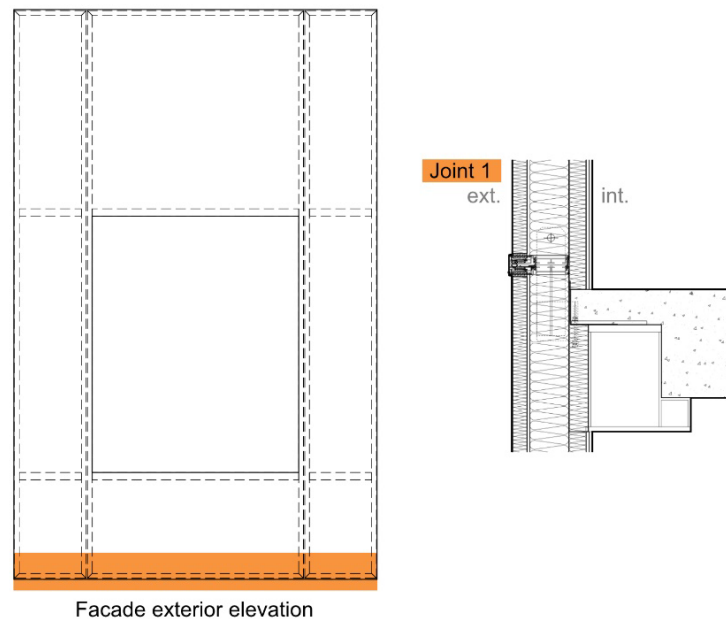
The aluminium frame panel's joint shown on facade elevation and its detail.
